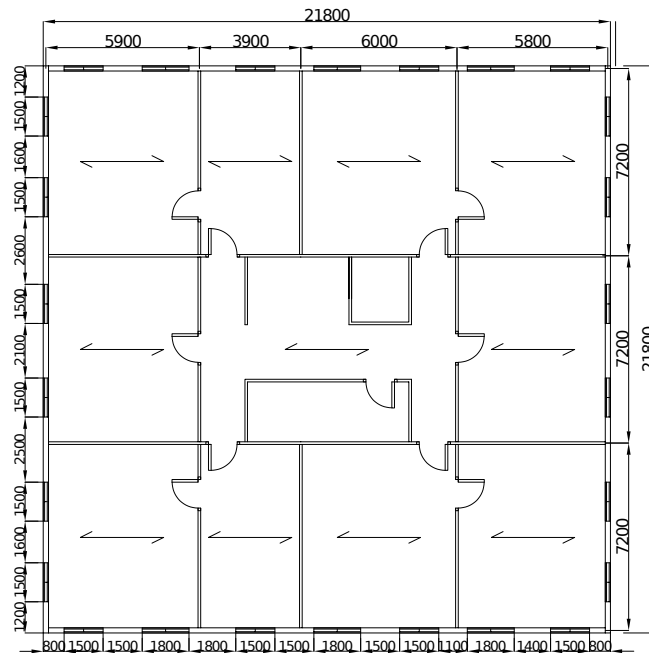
Layout of the floor plan of the building with dimensions in [mm].
